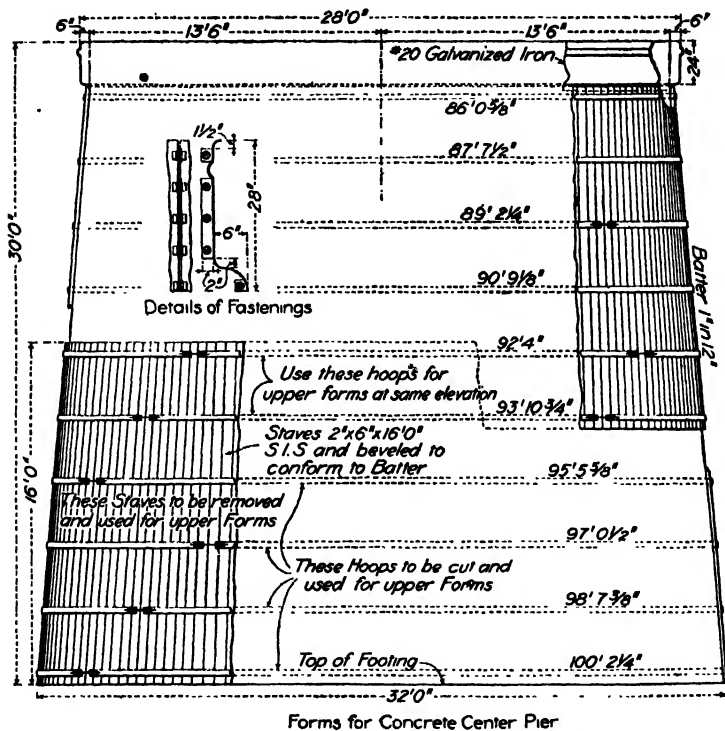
Form for Constructing Concrete Pivot Pier.
